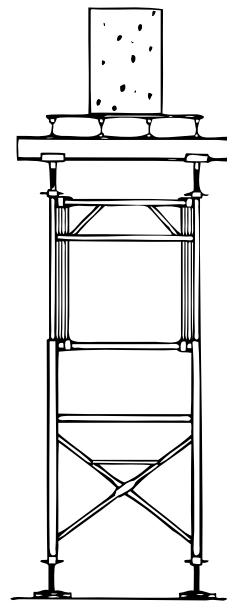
Typical concrete beam shoring with Aluminum Shoring Joist.
